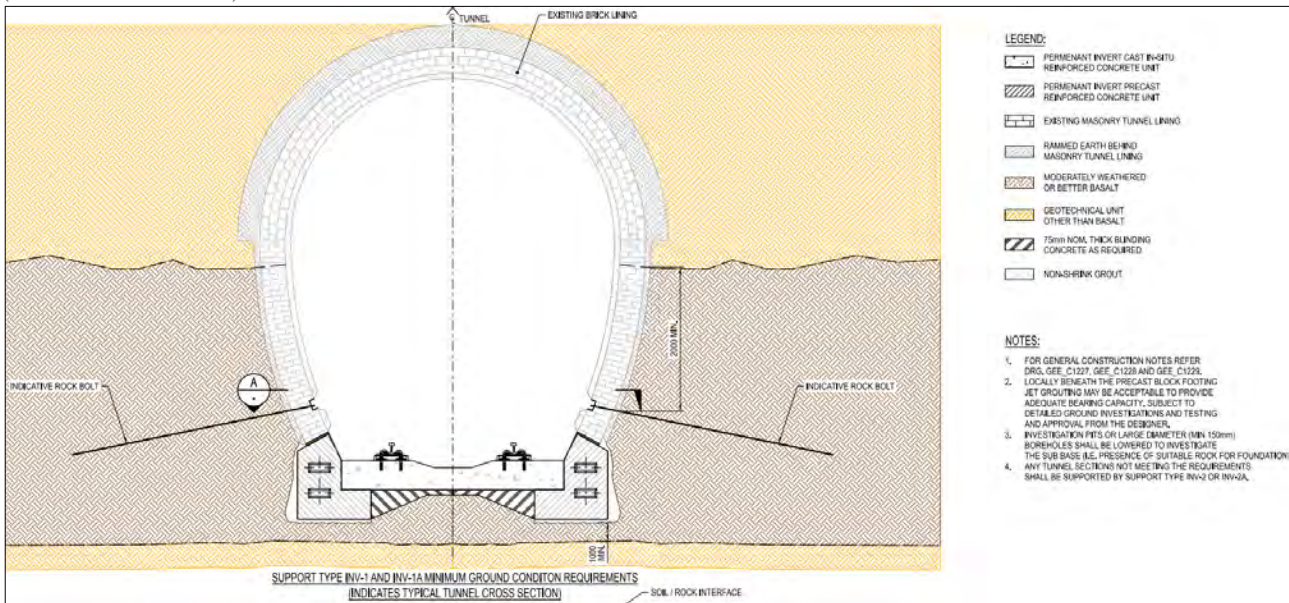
TYPICAL CROSS SECTION THROUGH TUNNEL LINING. (SOURCE: AURECON/VLINE)
